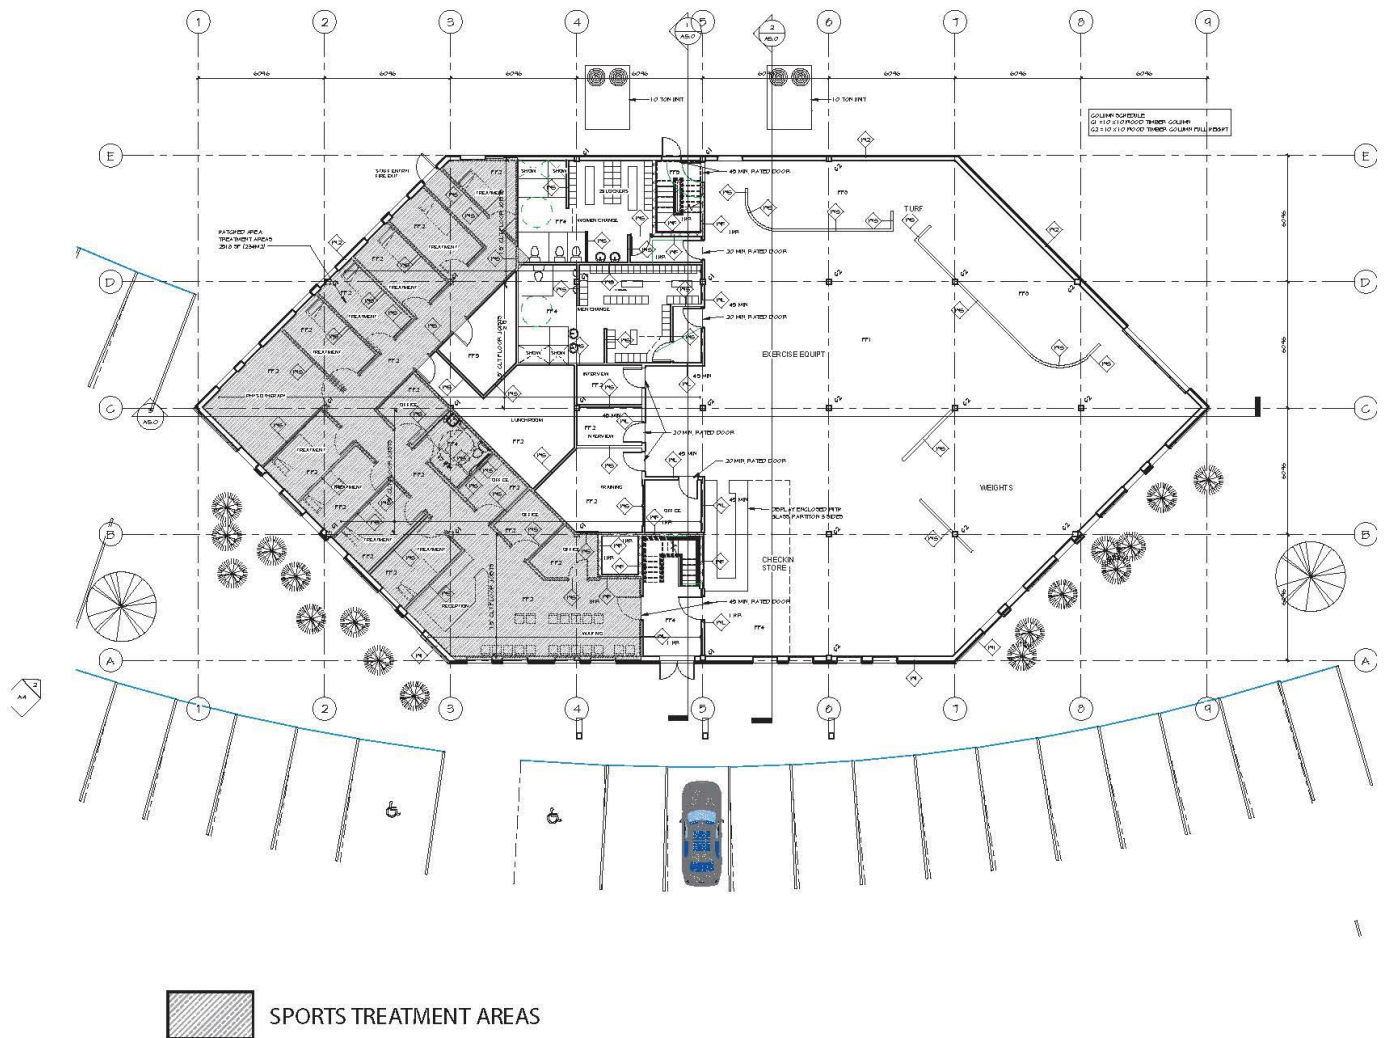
C PROPOSED SITE PLAN & BUILDING RENDERINGS
